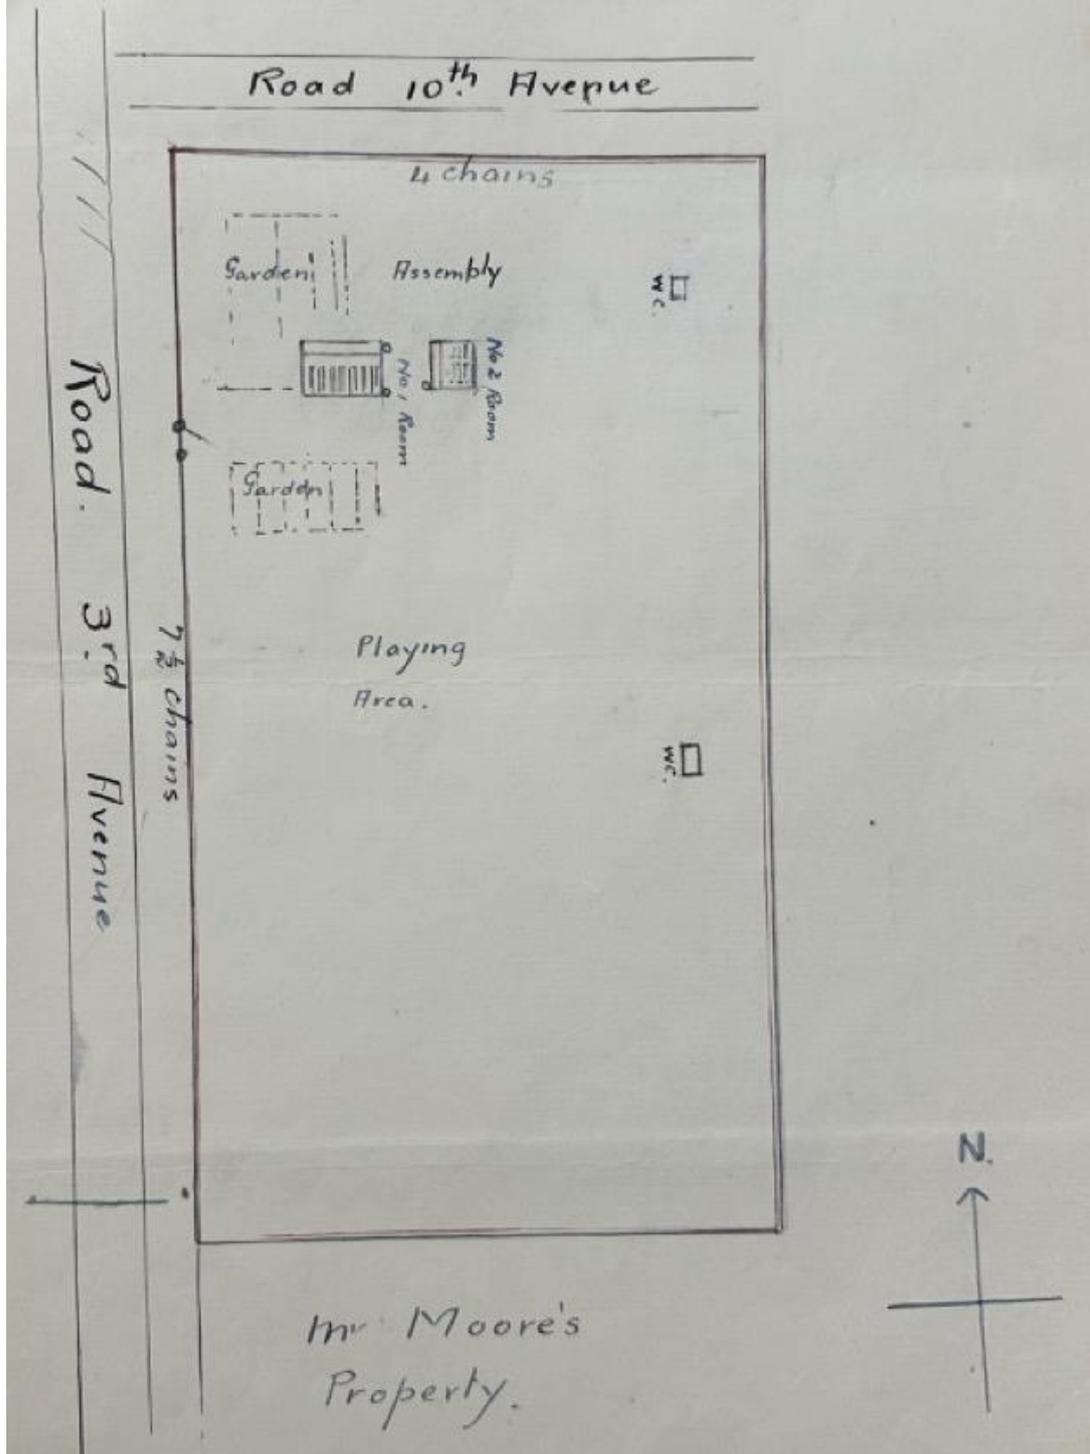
Sketch plan of the original school building dating from c.1934.
